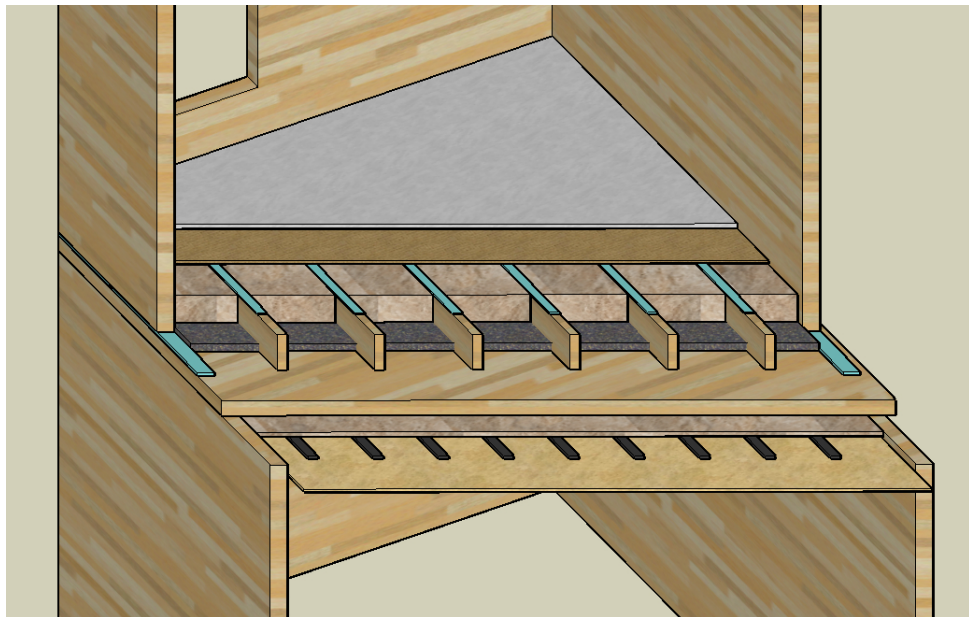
Isometric structural section showing the material layers included in a junction of 2 vertically adjacent bedrooms of the test building. Other adjacent rooms or construction parts have been excluded from this sketch. The F.E. model developed in this study follows exactly the same design concept. Picture based on construction plans of FristadsBygg [7].
